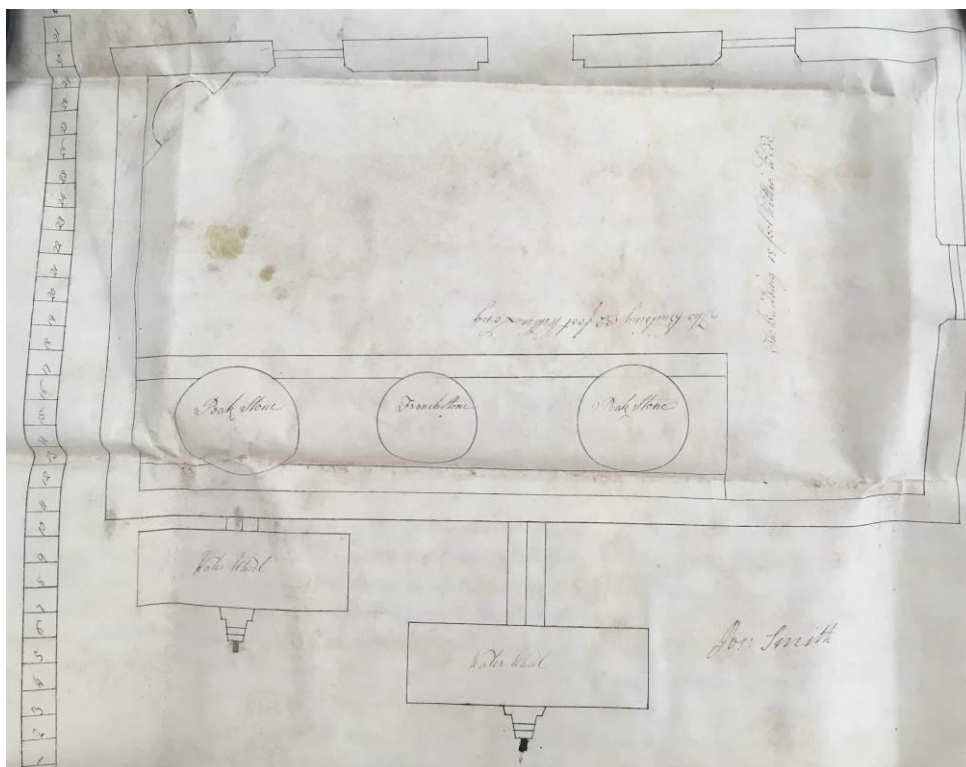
Plan of proposed mill in Lichfield in 1753 showing two water wheels.⁴⁰
